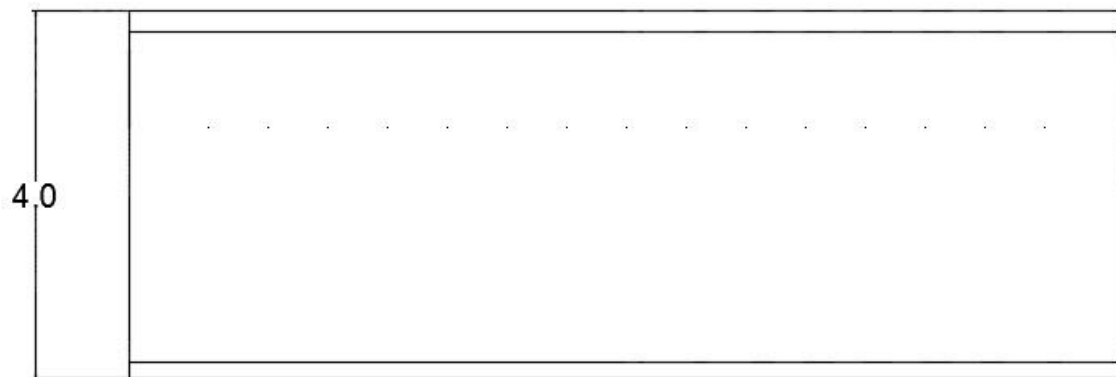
4 m is the floor-to-floor height, (not-to-scale)
